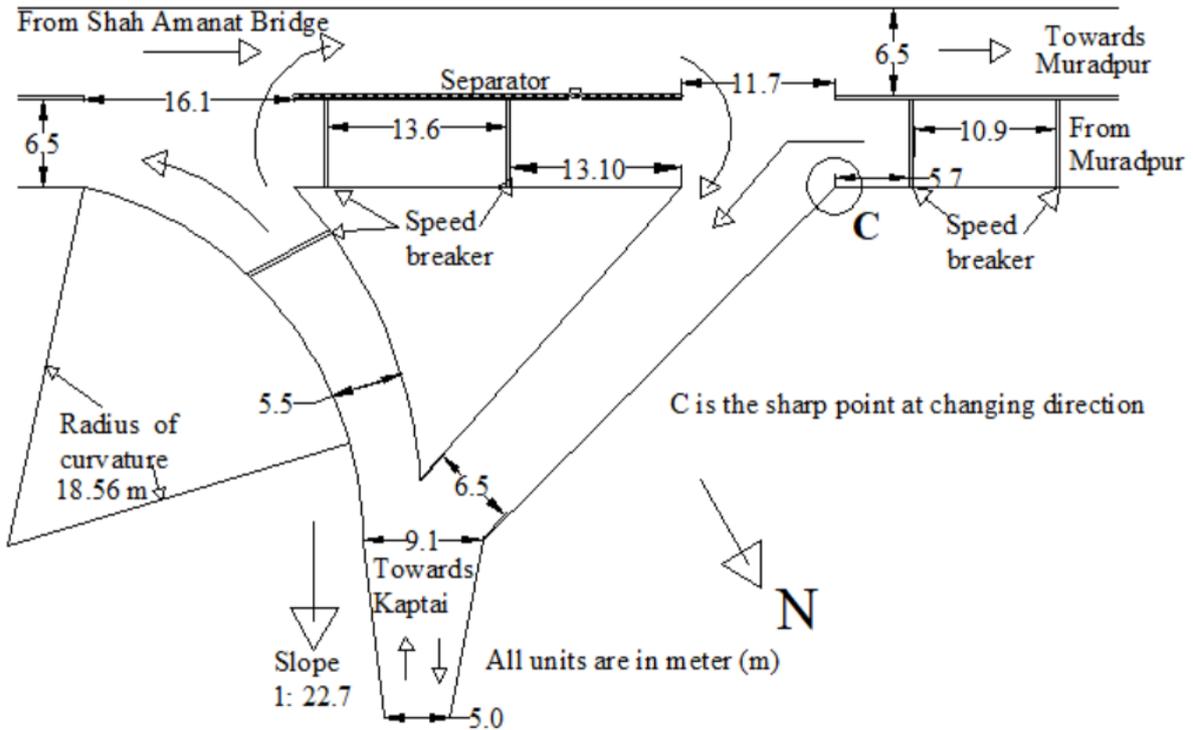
Existing Geometric Elements of Bahaddarhat Flyover
